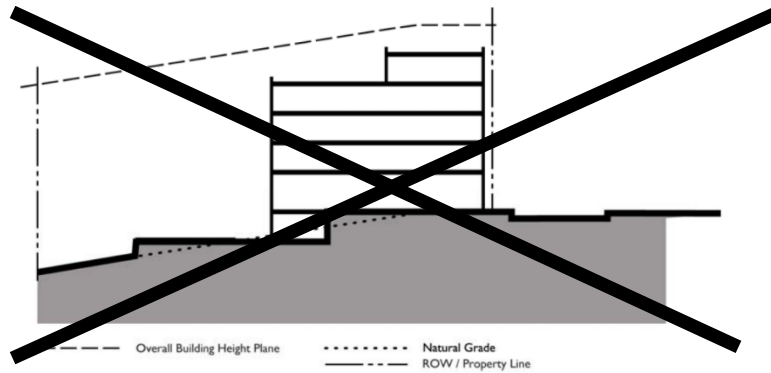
C. Flat roof building height measurements (not drawn to scale).
